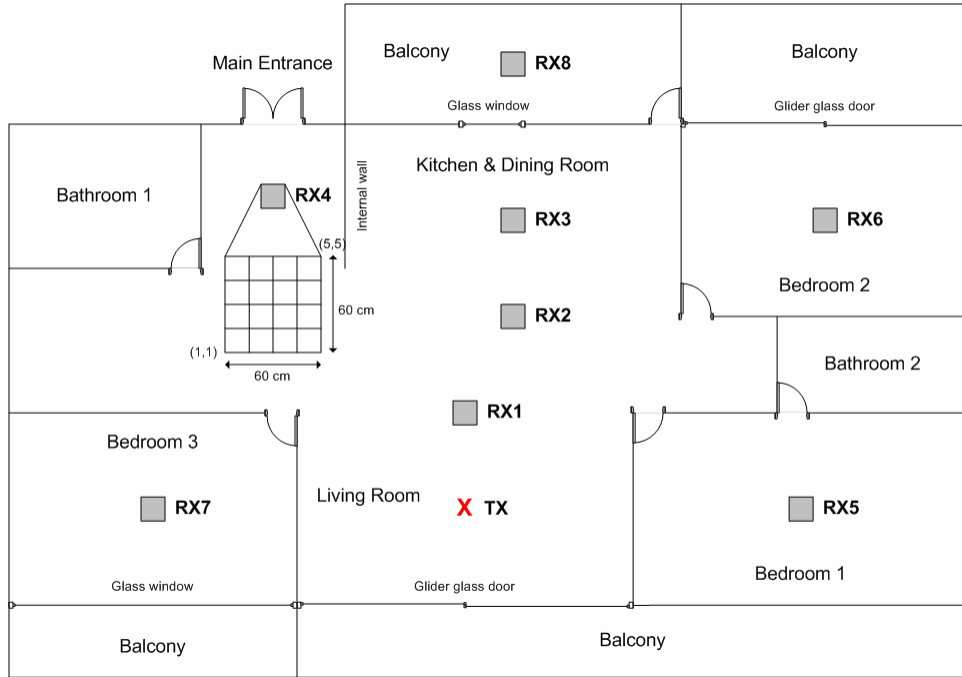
Sketched plan of the 3-bedrooms apartment.
